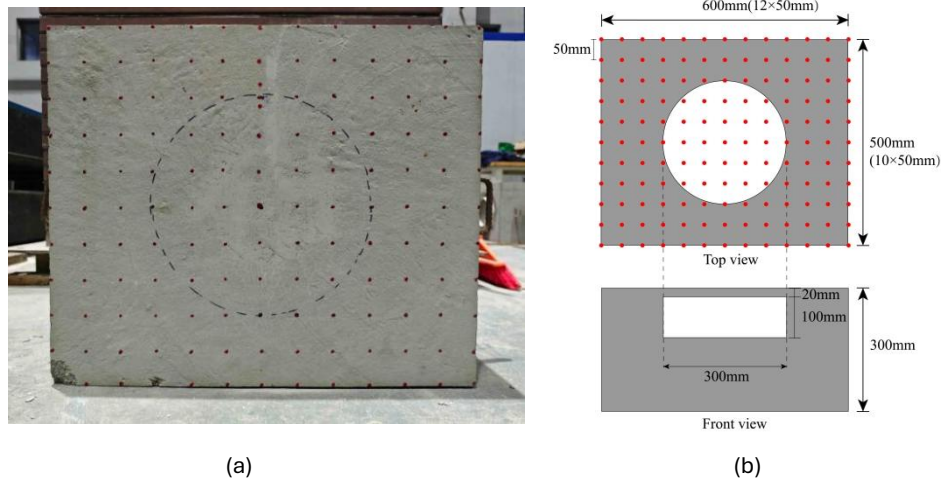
Measurement point layout of the concrete specimen: (a) Photograph of the concrete specimen; (b) Layout of measurement points
